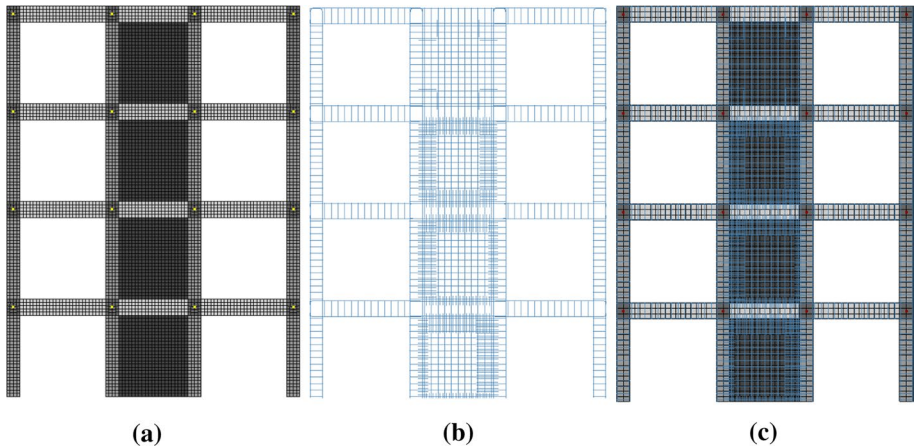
a Monolithic RC frame with RC infills with plane stress elements, b Embedded reinforcement bars for the existing frame and web reinforcements and dowels, c Complete FE model I (DIANA FEA BV 2019)
